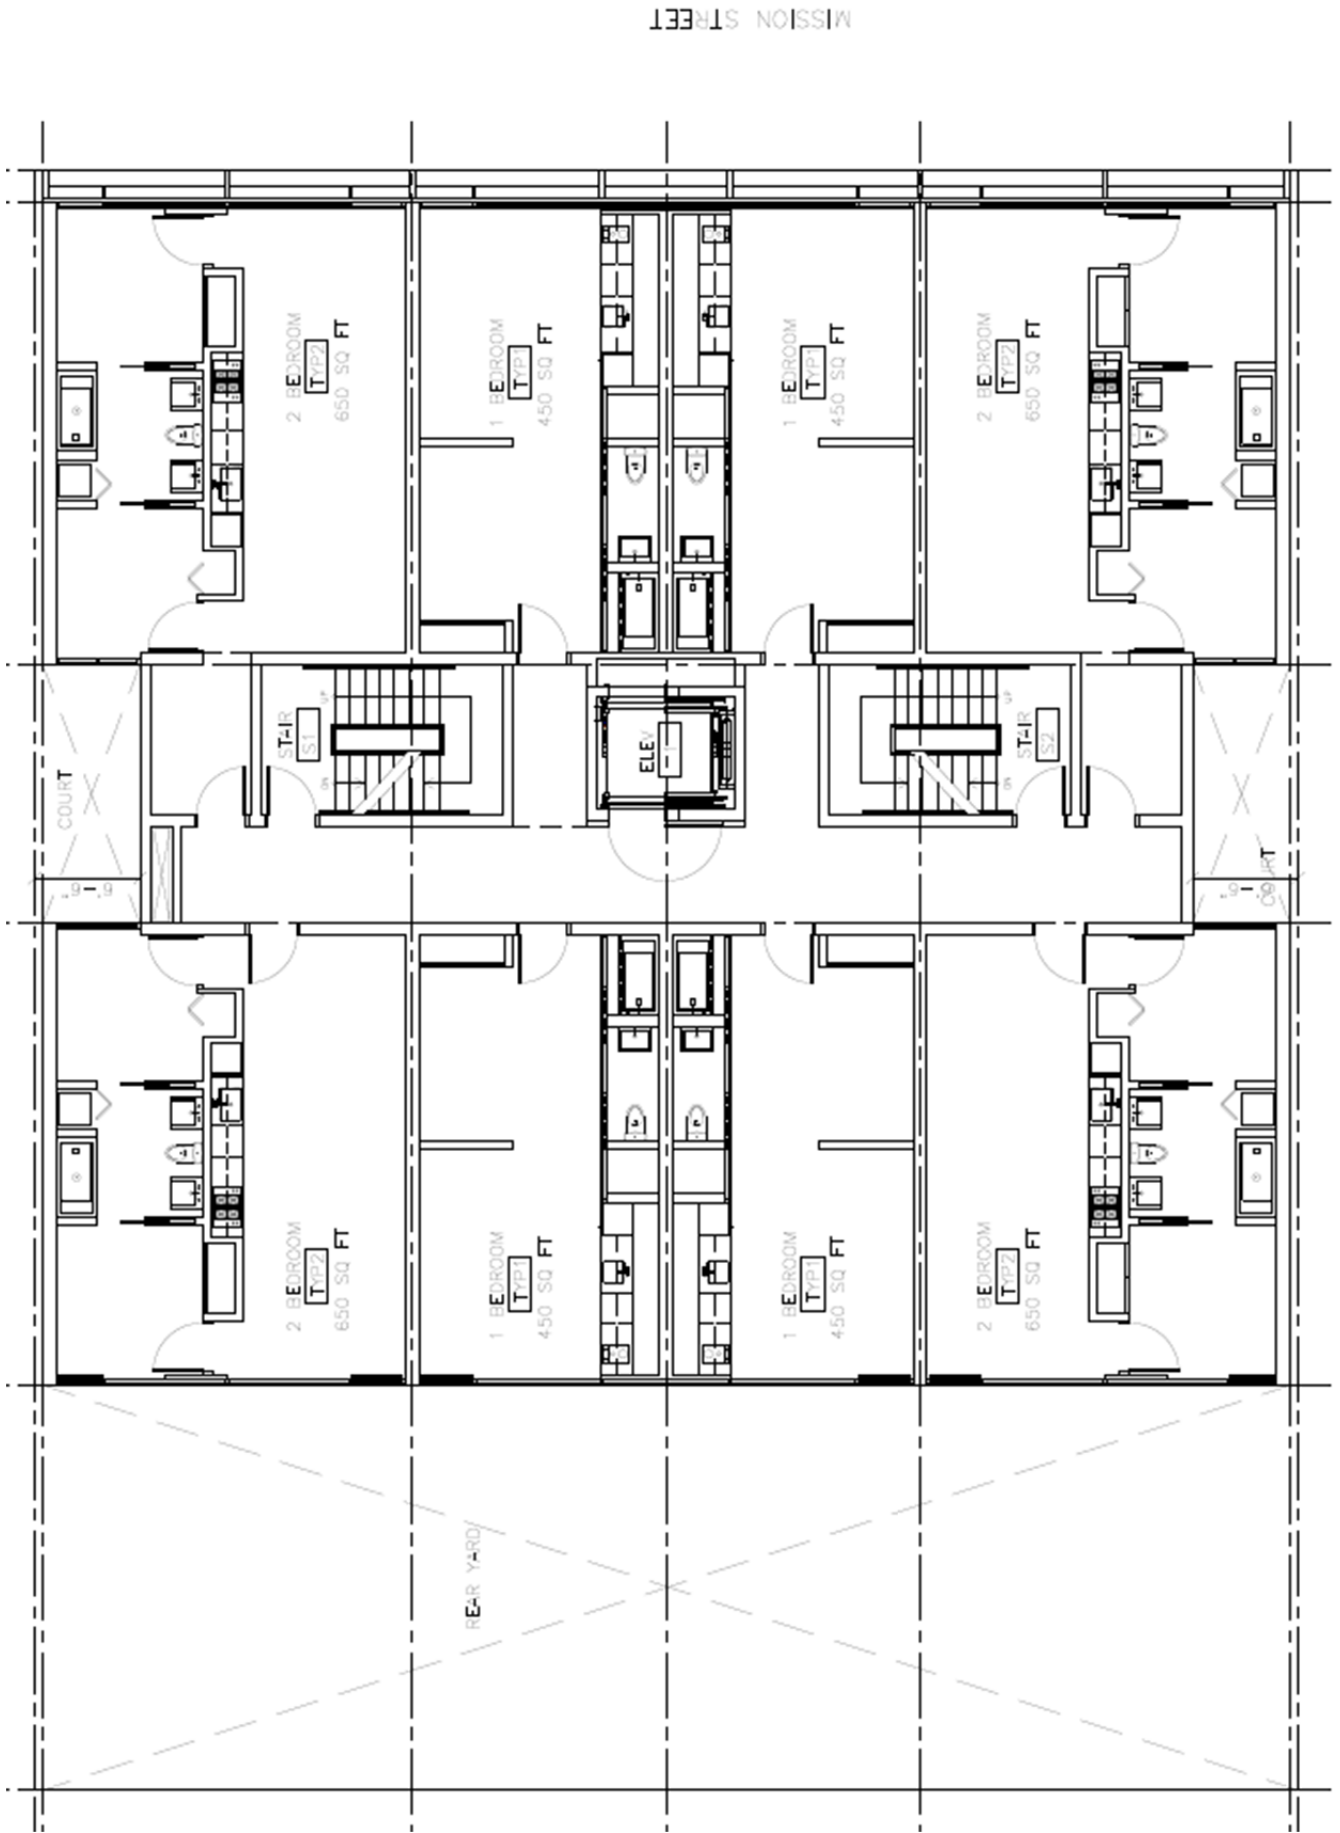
PROPOSED FIFTH FLOOR PLAN
